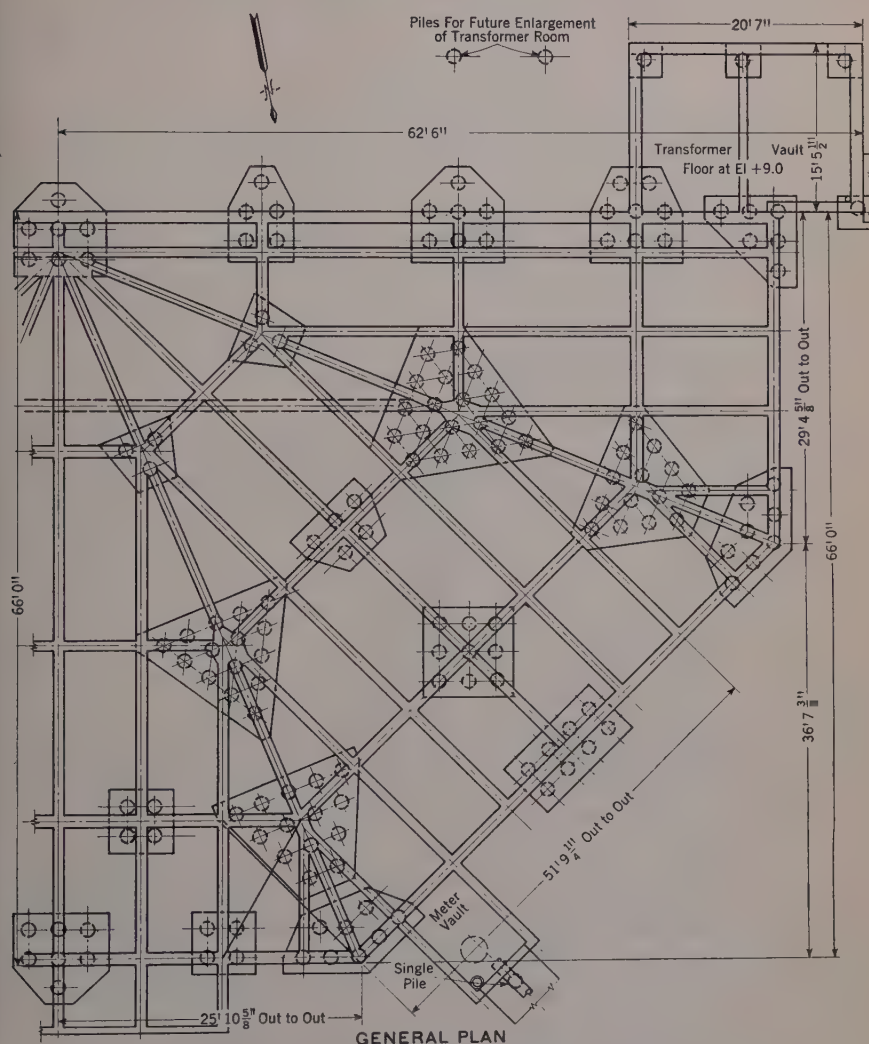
DESIGN OF FOUNDATION, OFFICE BUILDING
